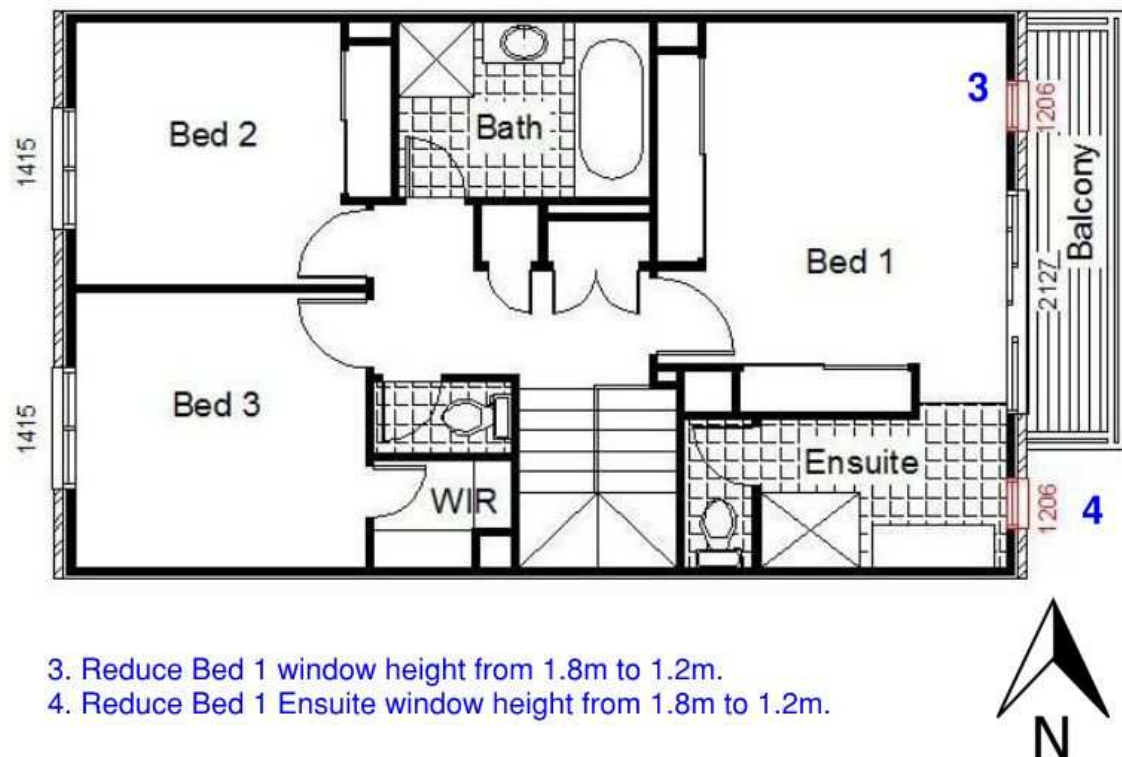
Redesigned first floor plan for Dwelling 16 in Darwin.
